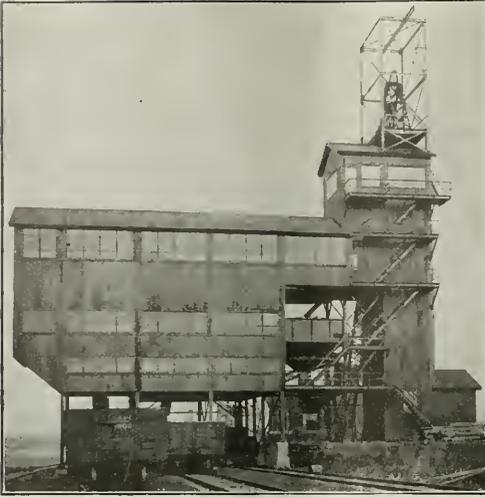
TIPPLE LOOKING DOWN RAILROAD SIDETRACK
